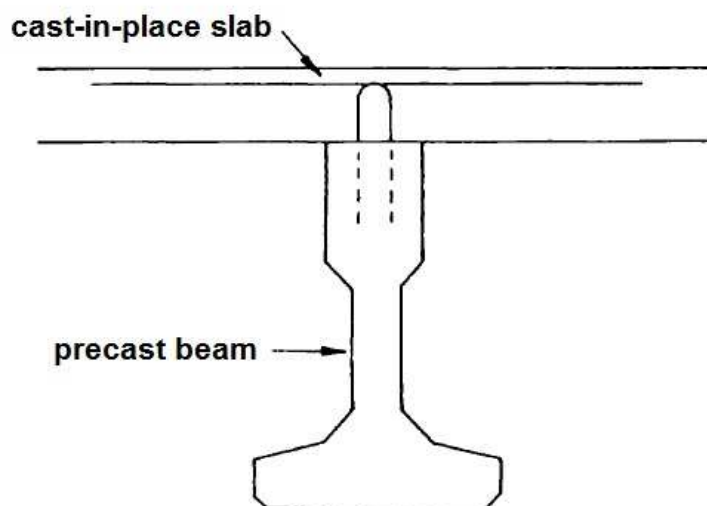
Interface between an I-shaped precast beam and a cast-in-place slab.
